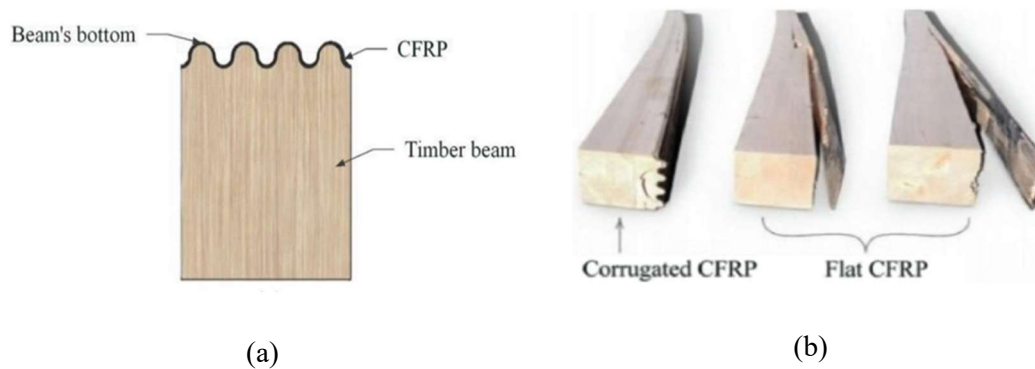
(a) Corrugated timber beam with FRP sheet laminated; (b) Failure modes in corrugated and flat beams with FRP sheets [39].
